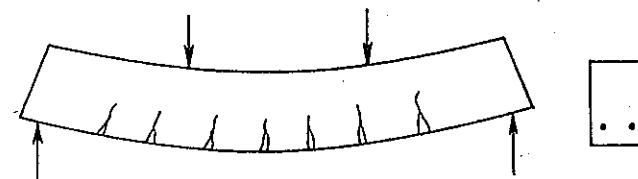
Failure Pattern of Under Reinforced Beam
